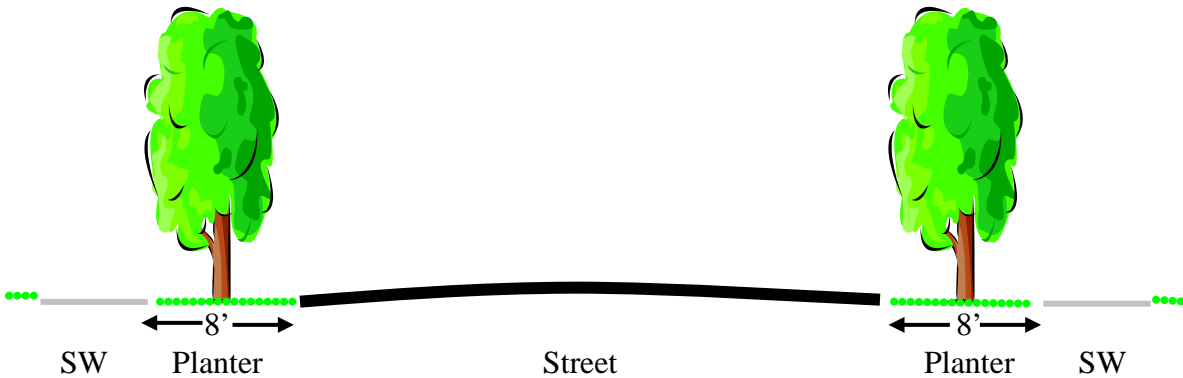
When space does not allow development of a full median, providing 8' planter strips will allow development of large, canopy forming trees. Planter strips should not be less than 6' wide. These narrow widths will only allow planting of small to medium sized trees that will not produce the canopy effect.
